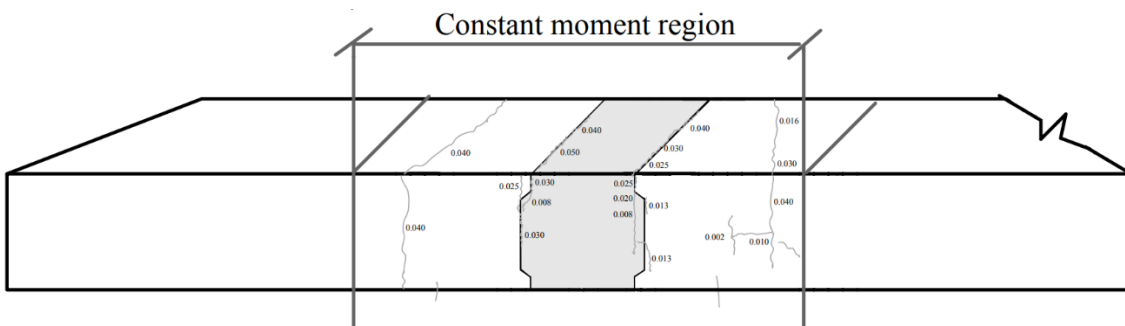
Crack Propagation for Proprietary Short-Term Specimen at 60 % of Final Load
